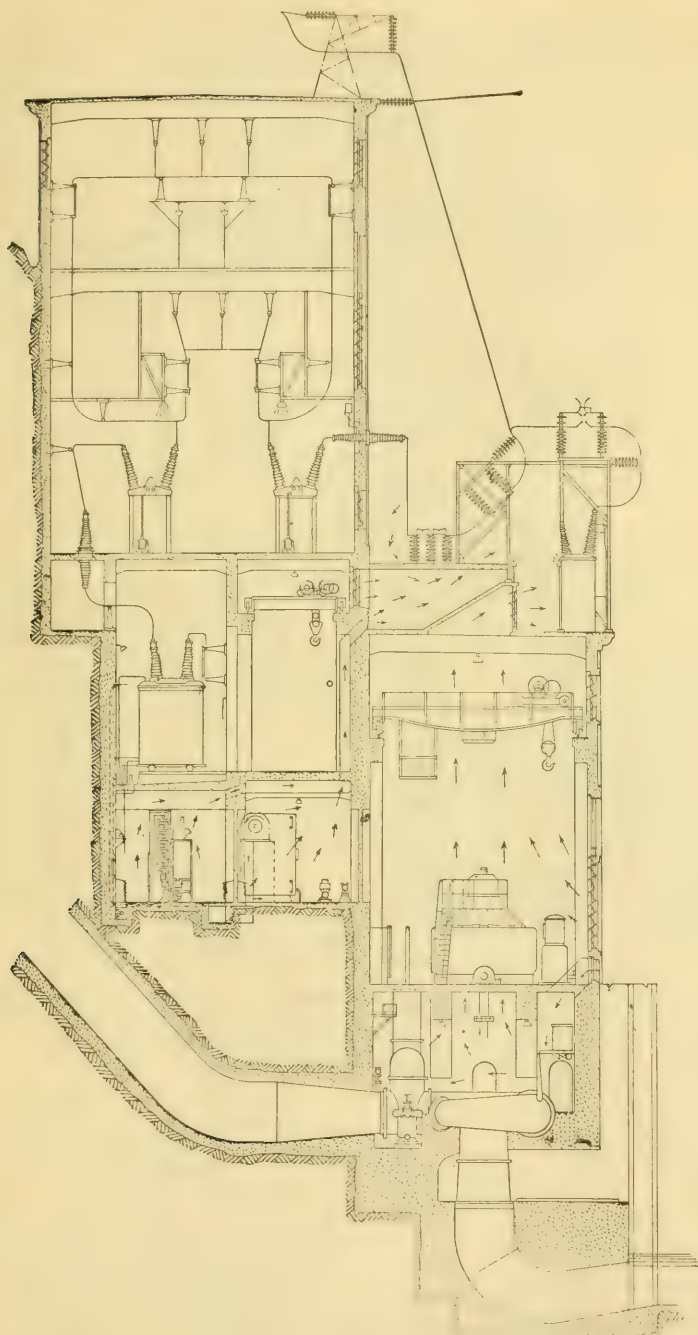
Cross-section of Generating Station, Ebro Irrigation and Power Company, Spain. (For plan view, see Fig. 102A.)
